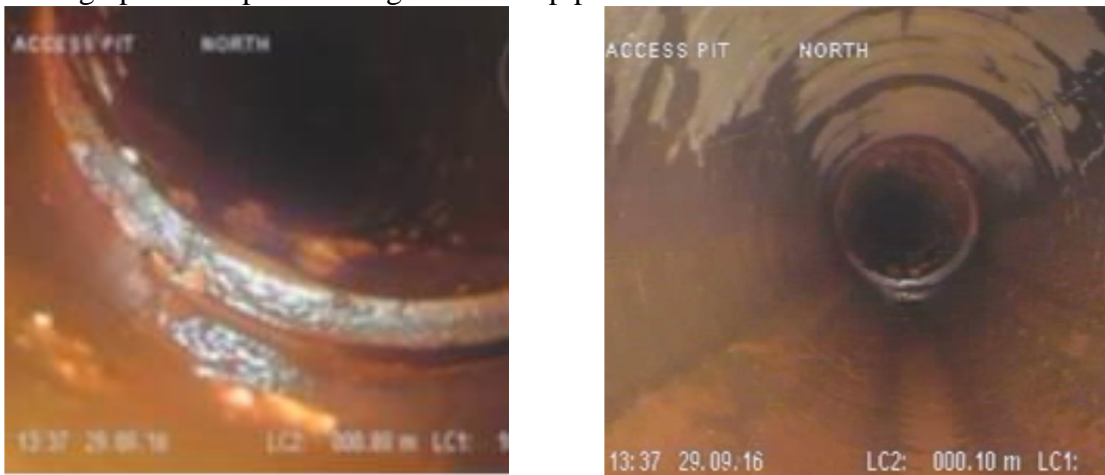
shows the photos from pre-cleaning video inspections. The existing pipe had both lined (cement mortar) and unlined sections. Some encrustation and open joints were visible. Excavations of pits, and installation of pipe spools (for test purpose) were carried out prior to pipe cleaning, inspection and lining activities.
